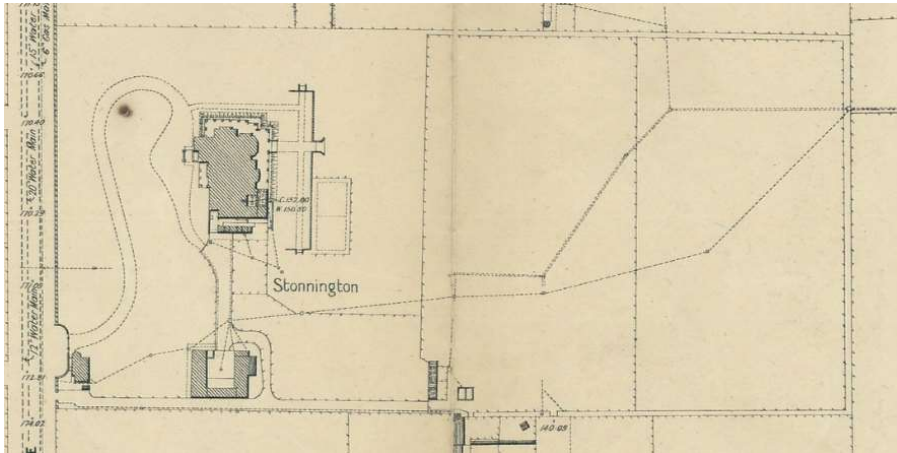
Detail of MMBW Plan No 59 Malvern, dated 1902, showing the extent of the Stonnington Estate before subdivision of the eastern part of the large allotment. (Source: SLV)
